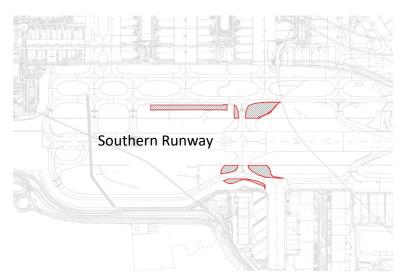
Redundant Pavement Areas outside 09L RHA
